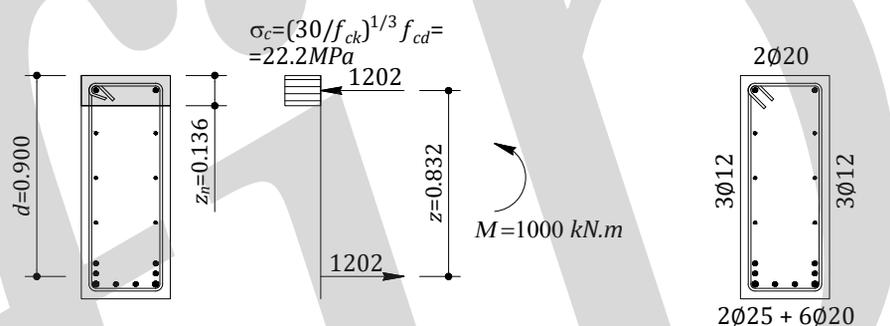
Sectional method and calculation of the bending reinforcement
